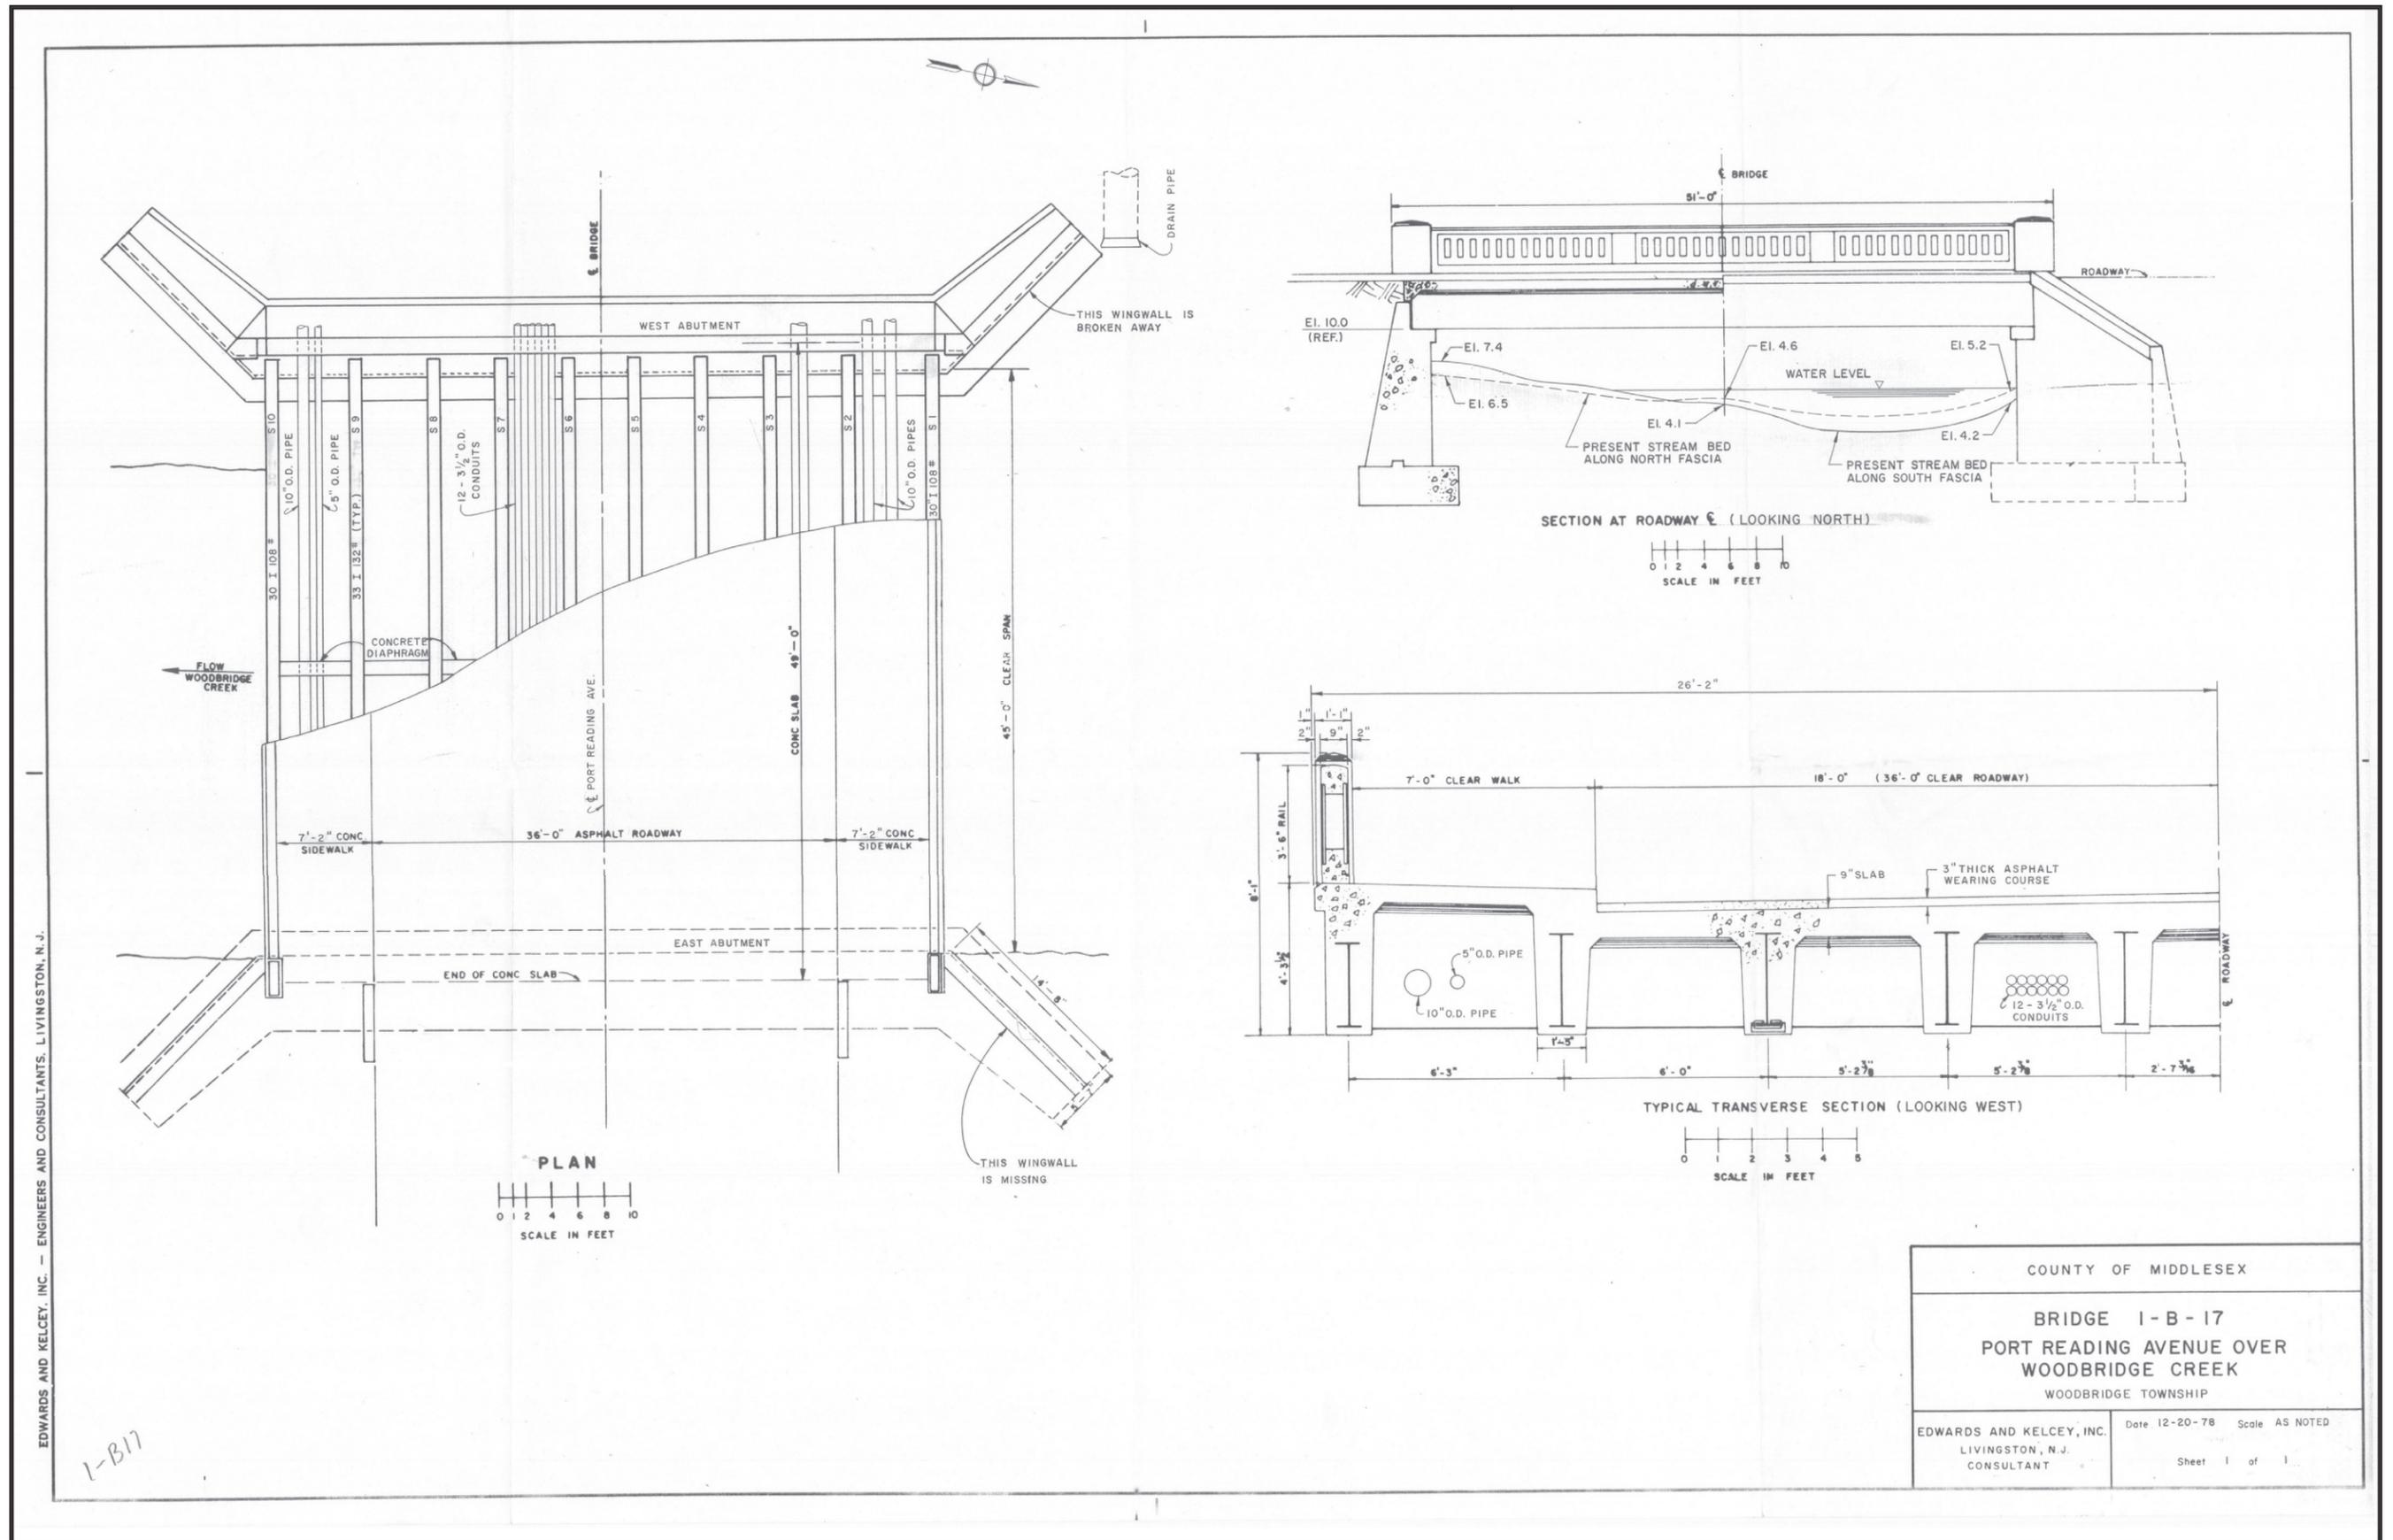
Plan and Sections of Bridge 1-B-17 (Port Reading Avenue over Woodbridge Creek), Woodbridge Township. (Source: Edwards and Kelcey, Inc. 1978).
